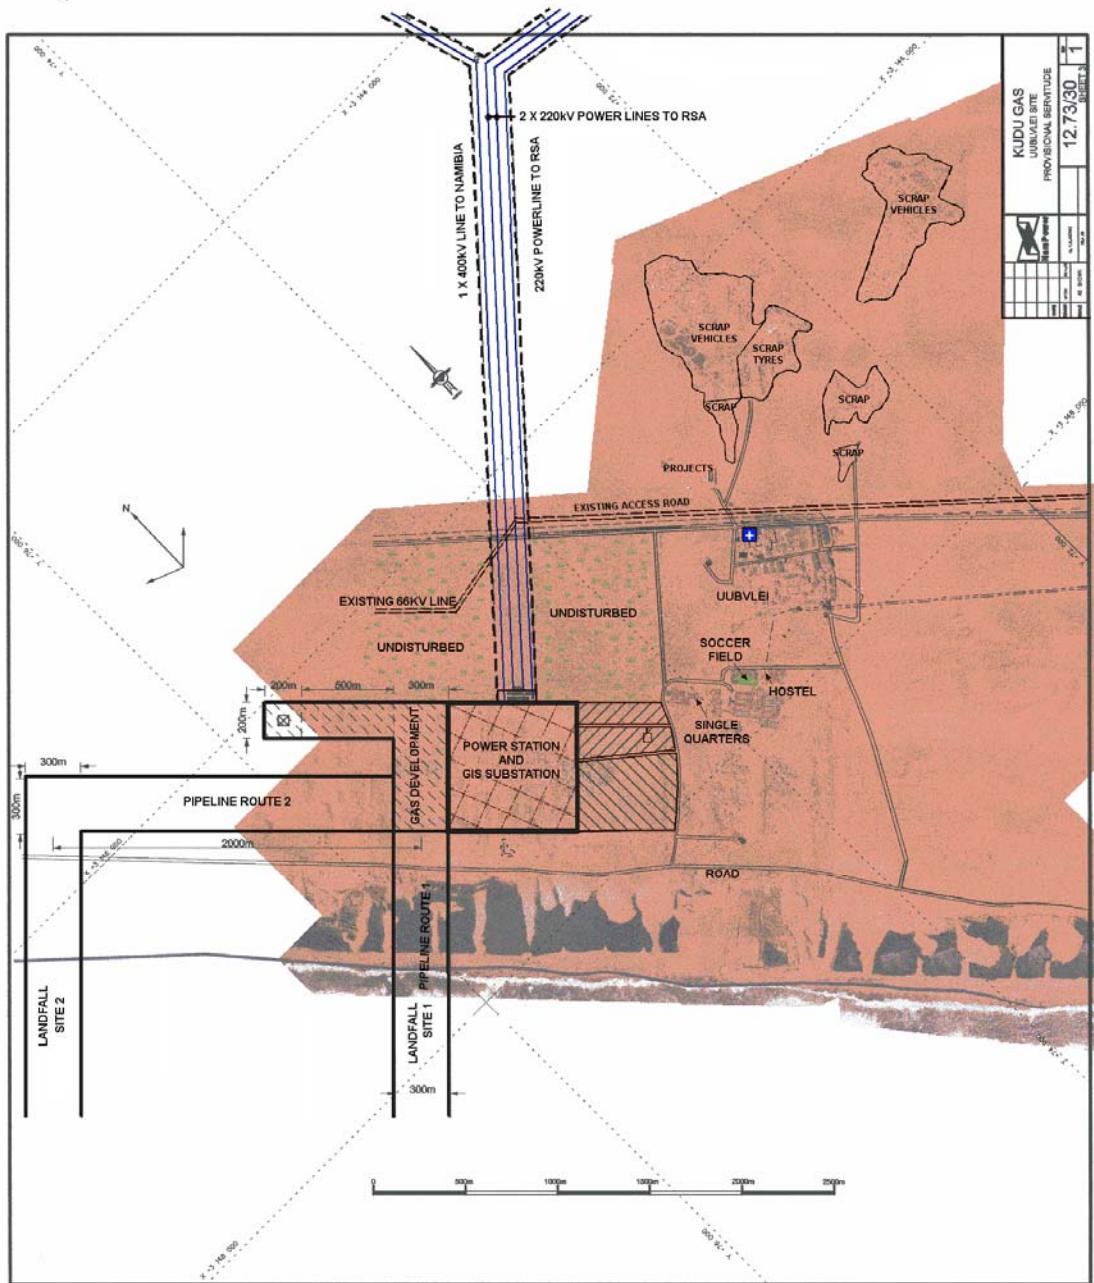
Site layout at Uubvlei (Source: NamPower)
